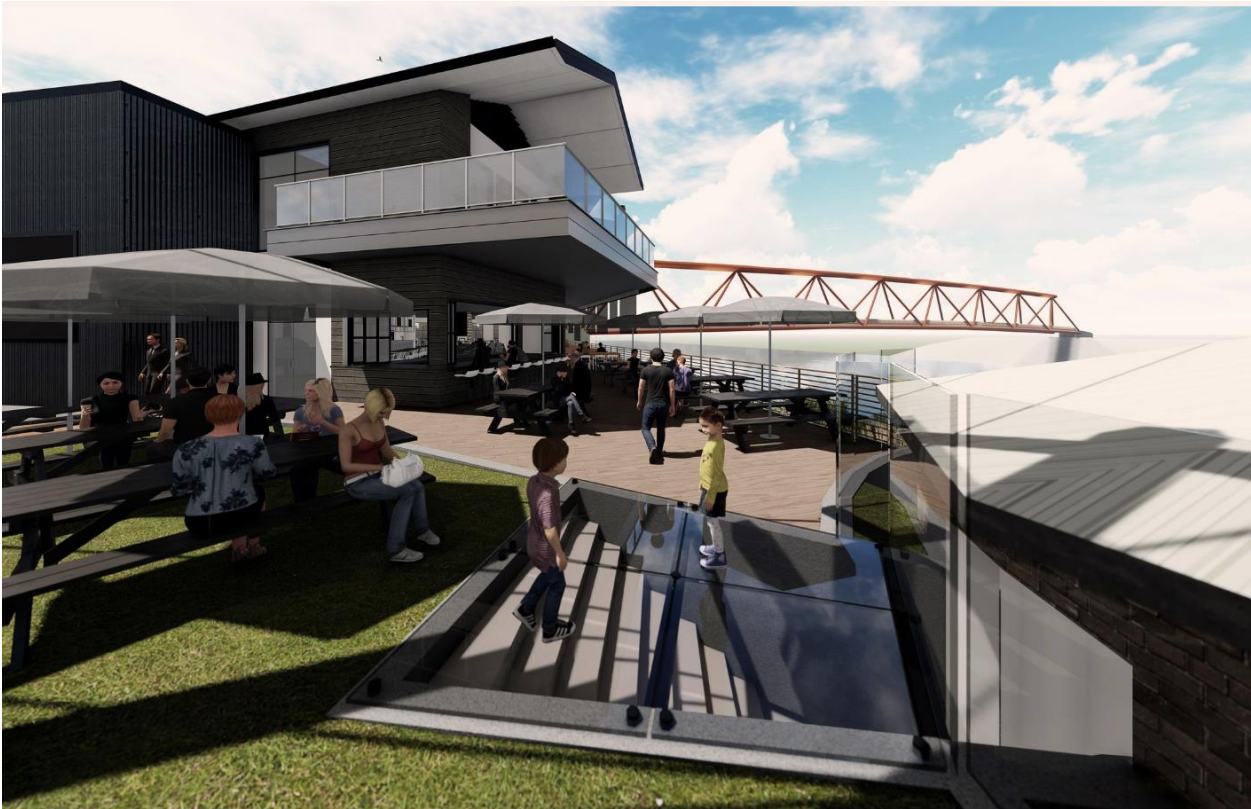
View west from the beer garden within the proposed development. Showing the proposed glazed cover over the Pump House entry - to view and protect the former pump house.
